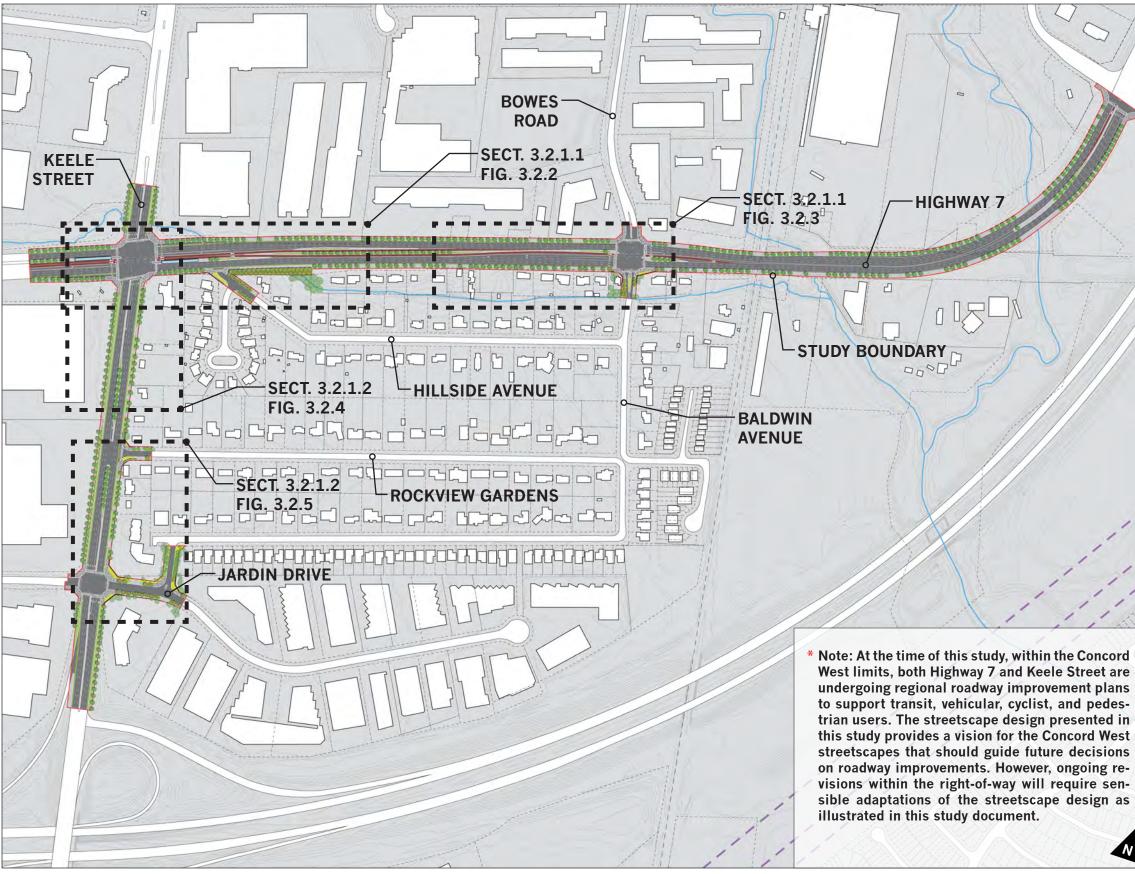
Concord West Streetscape Master Plan study area.
